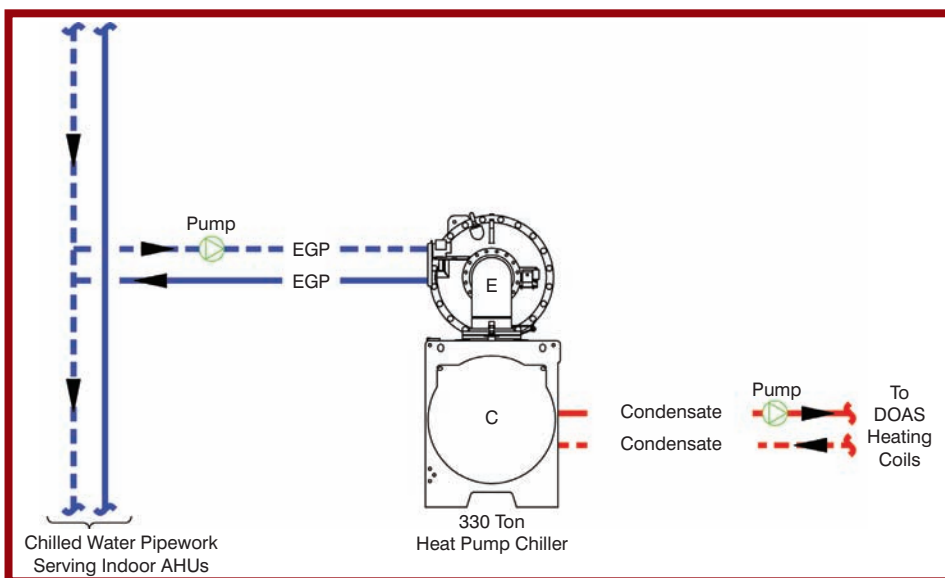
Connections of the new heat recovering heat pump chillers (typical).
